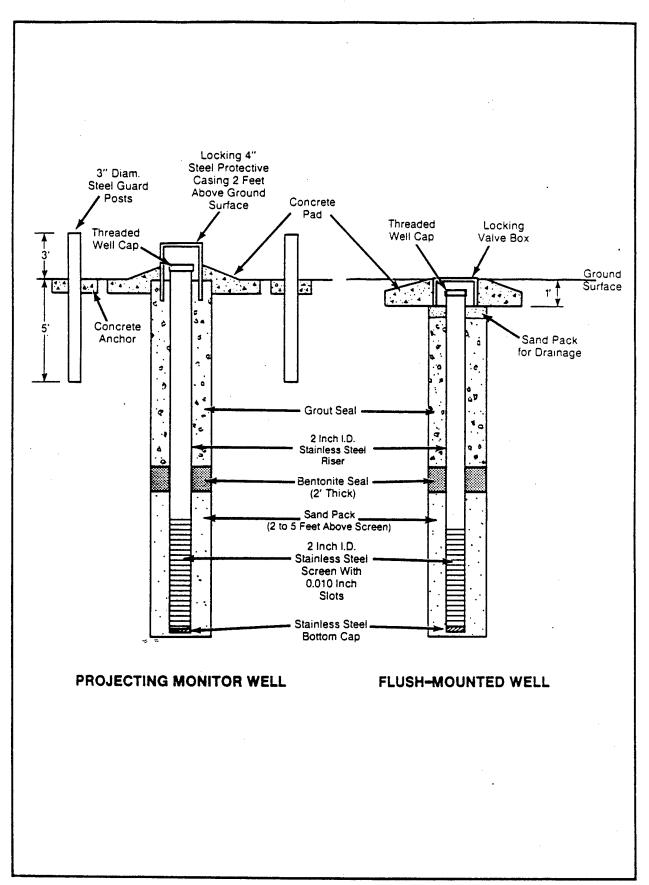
TYPICAL MONITOR WELL CONSTRUCTION
